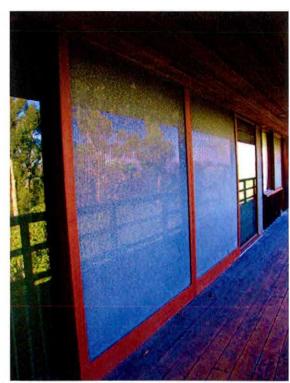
Typical sliding glass walls and fixed window walls along the north facade.
